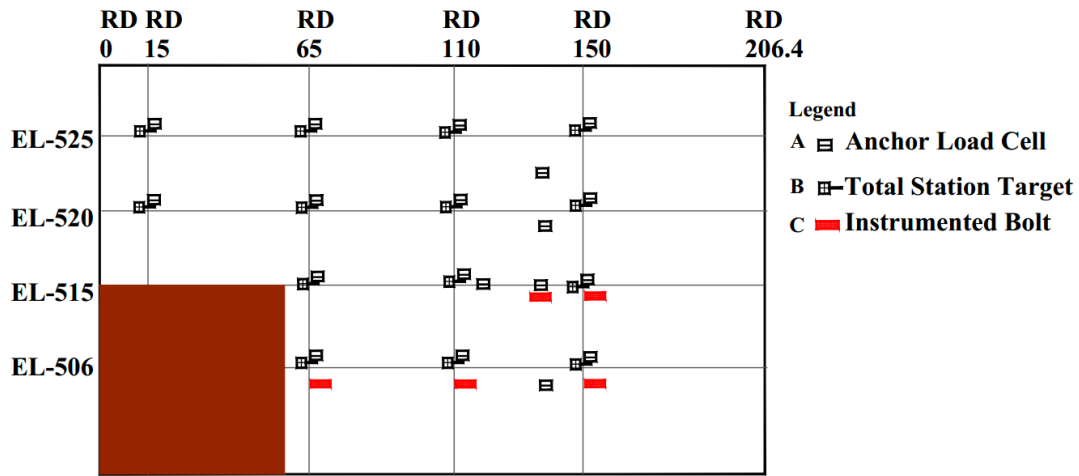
Longitudinal section of the powerhouse cavern showing location of instruments on upstream wall
